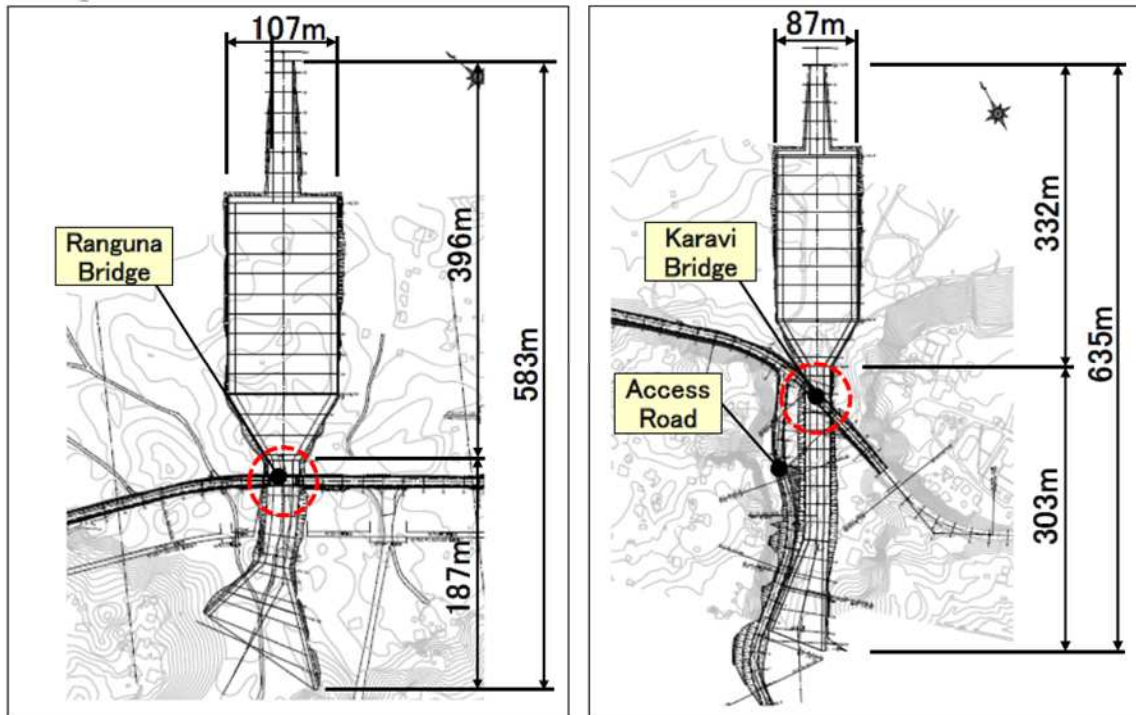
Plan Layout (Left: Ranguna Sediment Pond, Right: Karavi Sediment Pond)
